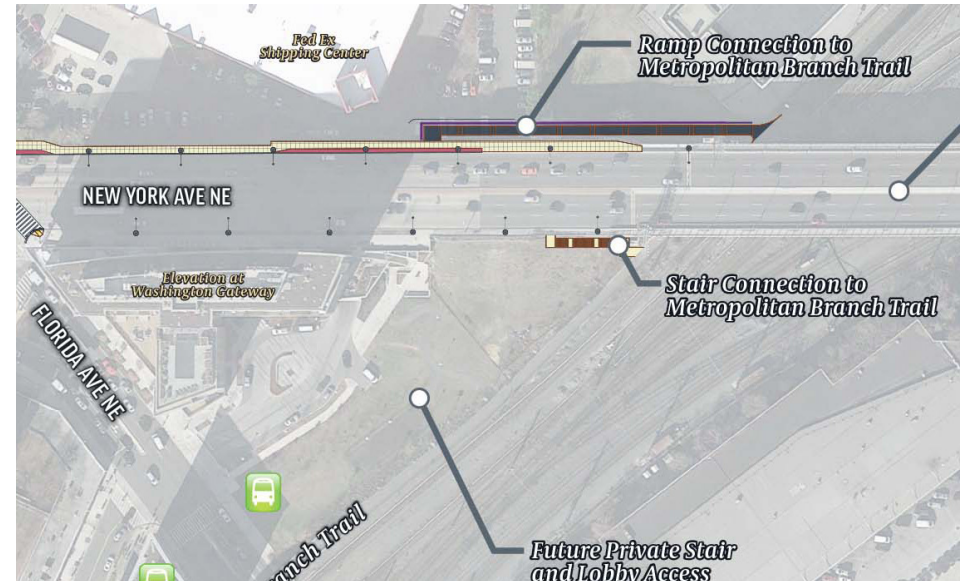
Proposed ramp and stair connection to MBT from New York Avenue NE.
